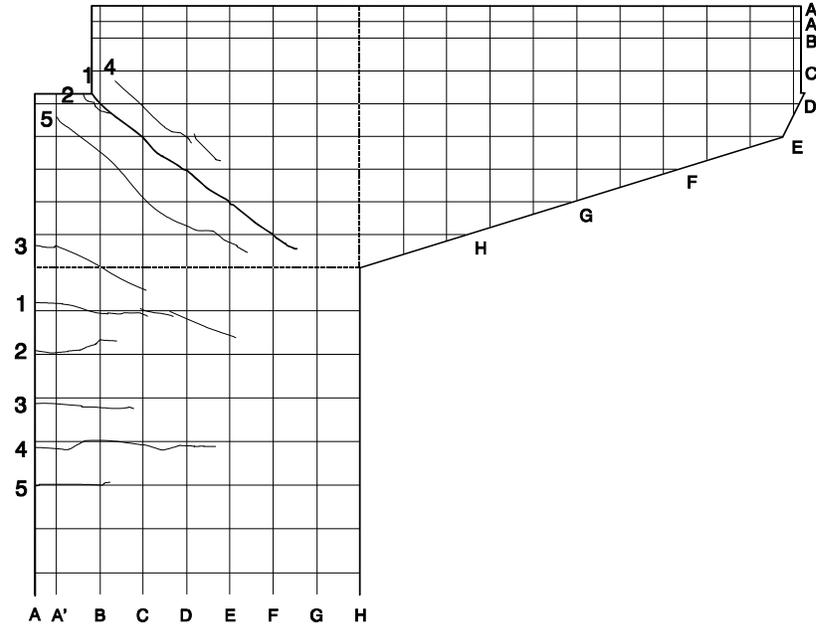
POJ-PS-100 cracking pattern on north face of specimen at dead load
